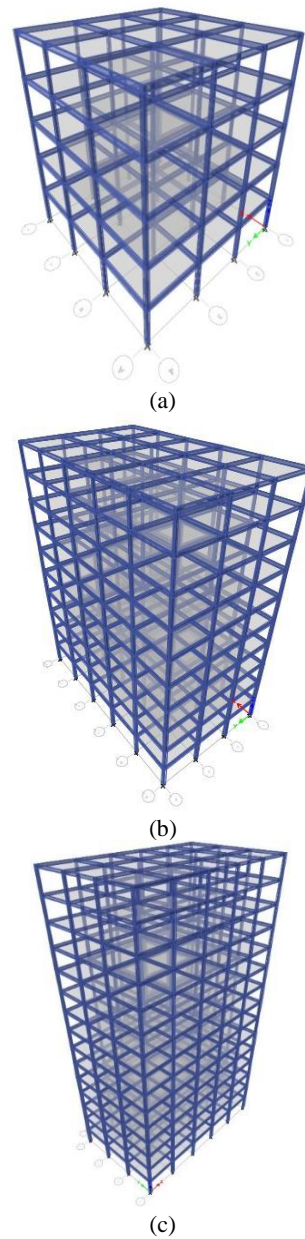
3D view of the structure models: a) 5- story structures, b) 10- story structures, c) 15- story structures
